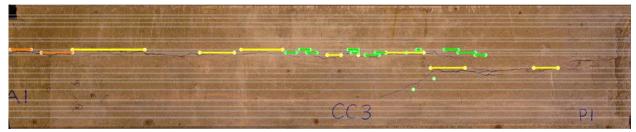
Damage Profile for Clearfield Creek Bridge Beam 3
